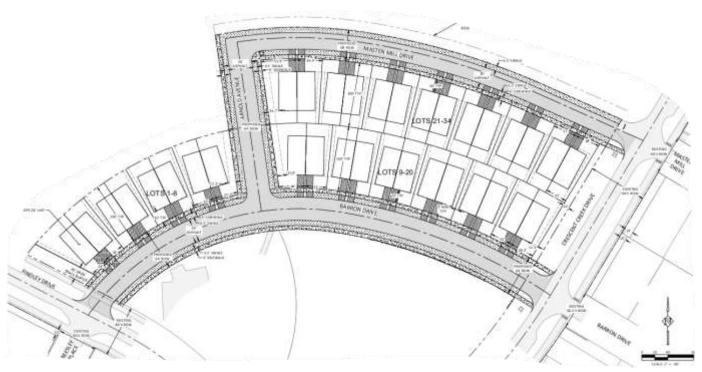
Proposed Site Plan. Source: HHPR, Dated March 2024.
